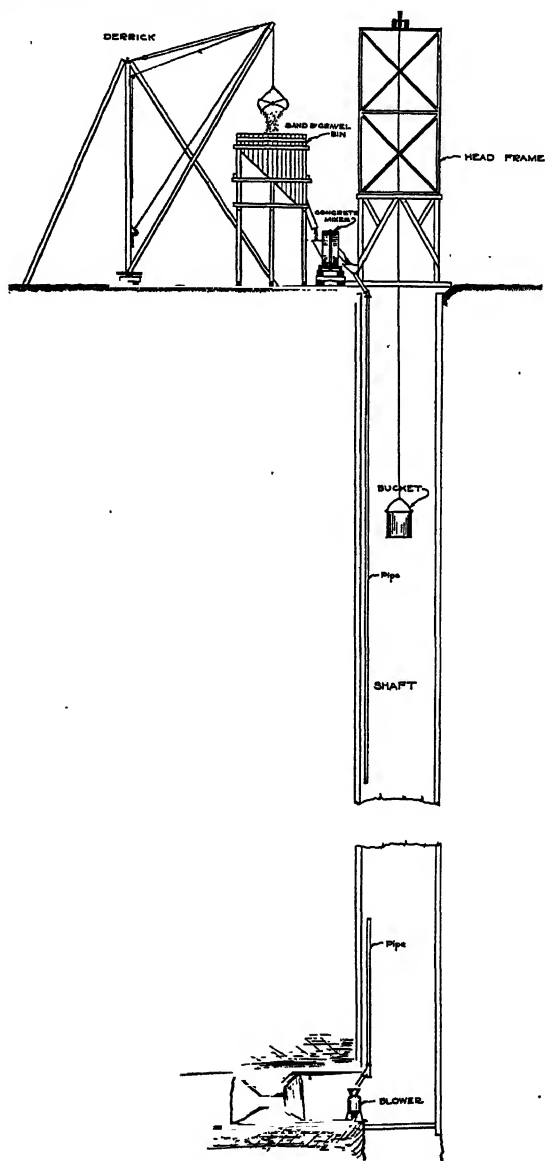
SKETCH SHOWING METHOD OF HANDLING CONCRETE DOWN MAIN SHAFT.
